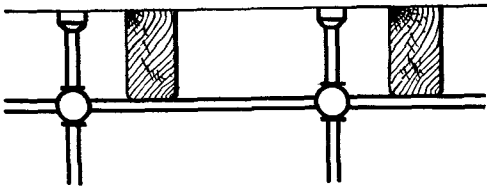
CONDUIT RUNNING AT RIGHT ANGLES TO CEILING JOISTS.
